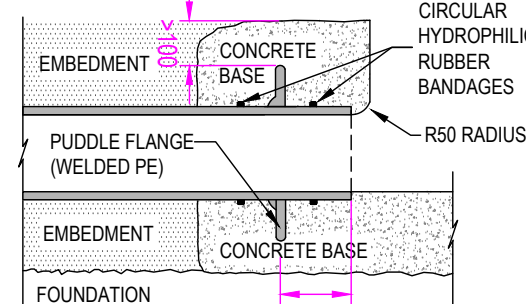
F: PE PIPE CONNECTION (SECTION VIEW)
